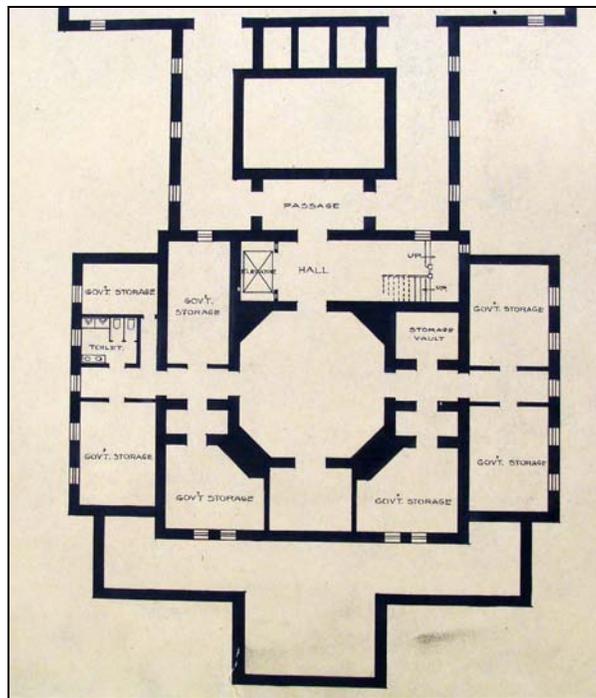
Excerpt of "Proposed Battle Mountain Sanitarium Basement Floor Plan"
